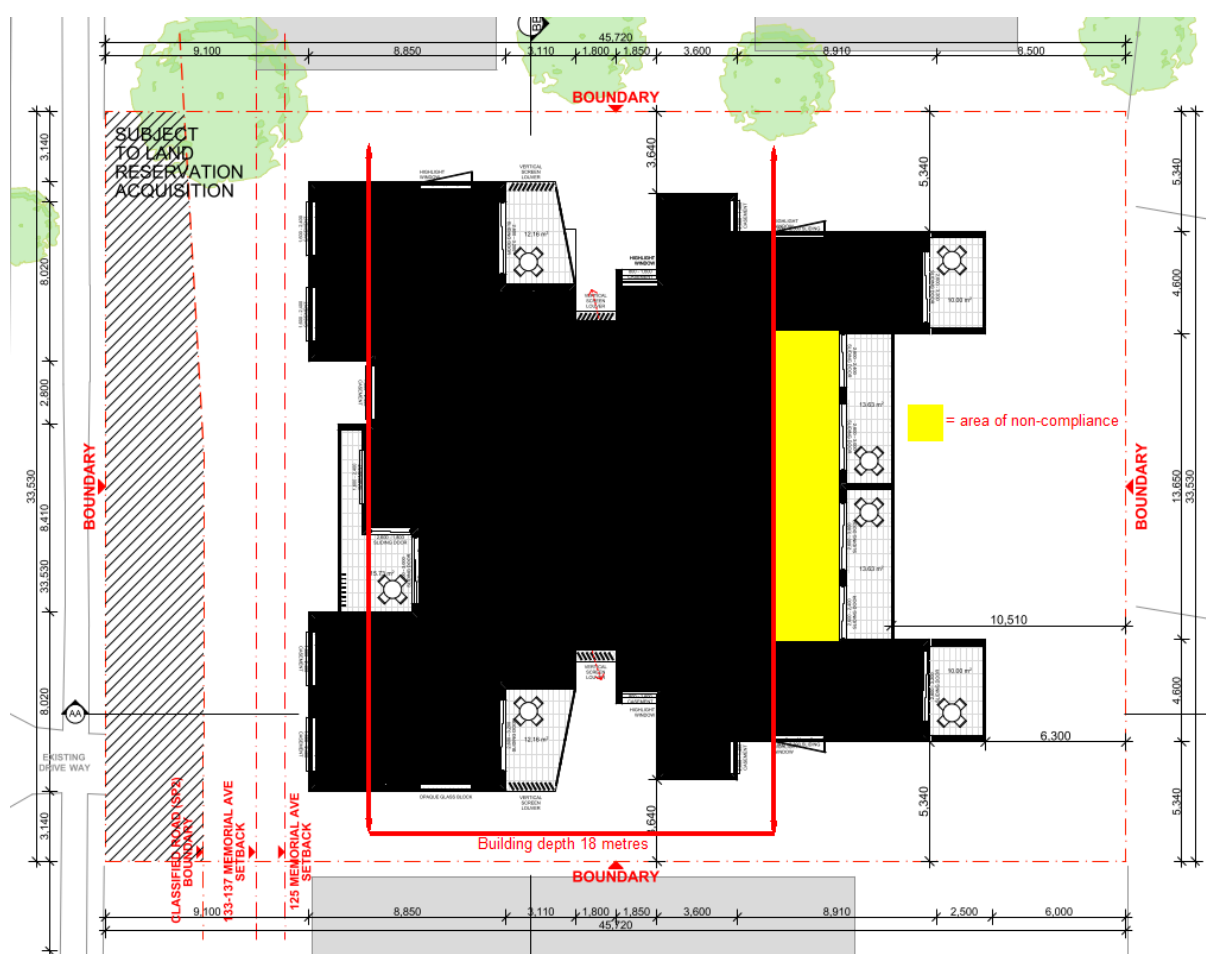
Extract of the floor plan that shows the extent of non-compliance with Building Depth on Level 1
